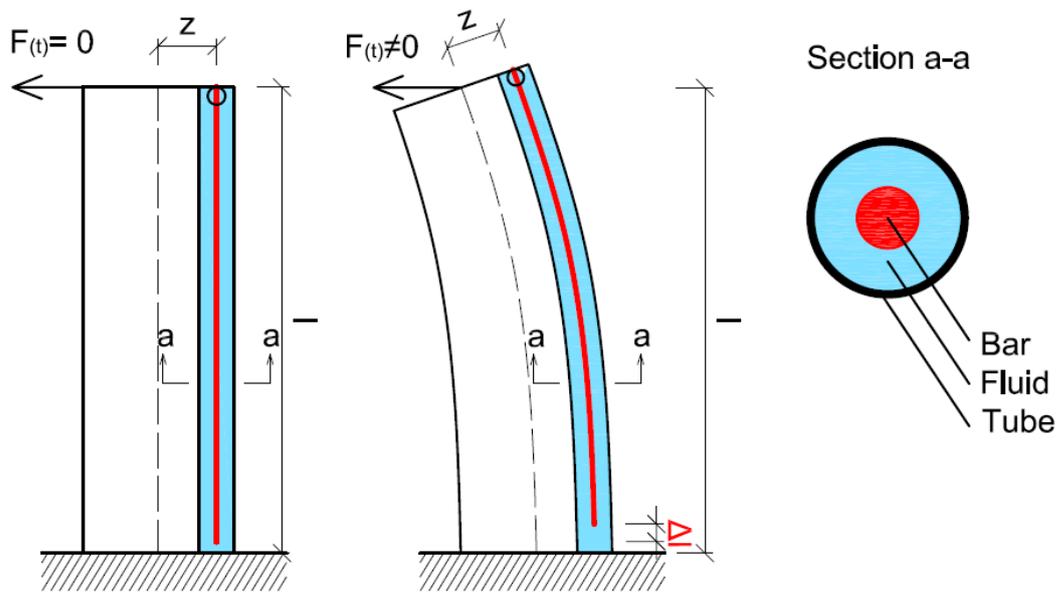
Cantilever beam with an integrated damper (Kollegger, 2009)
